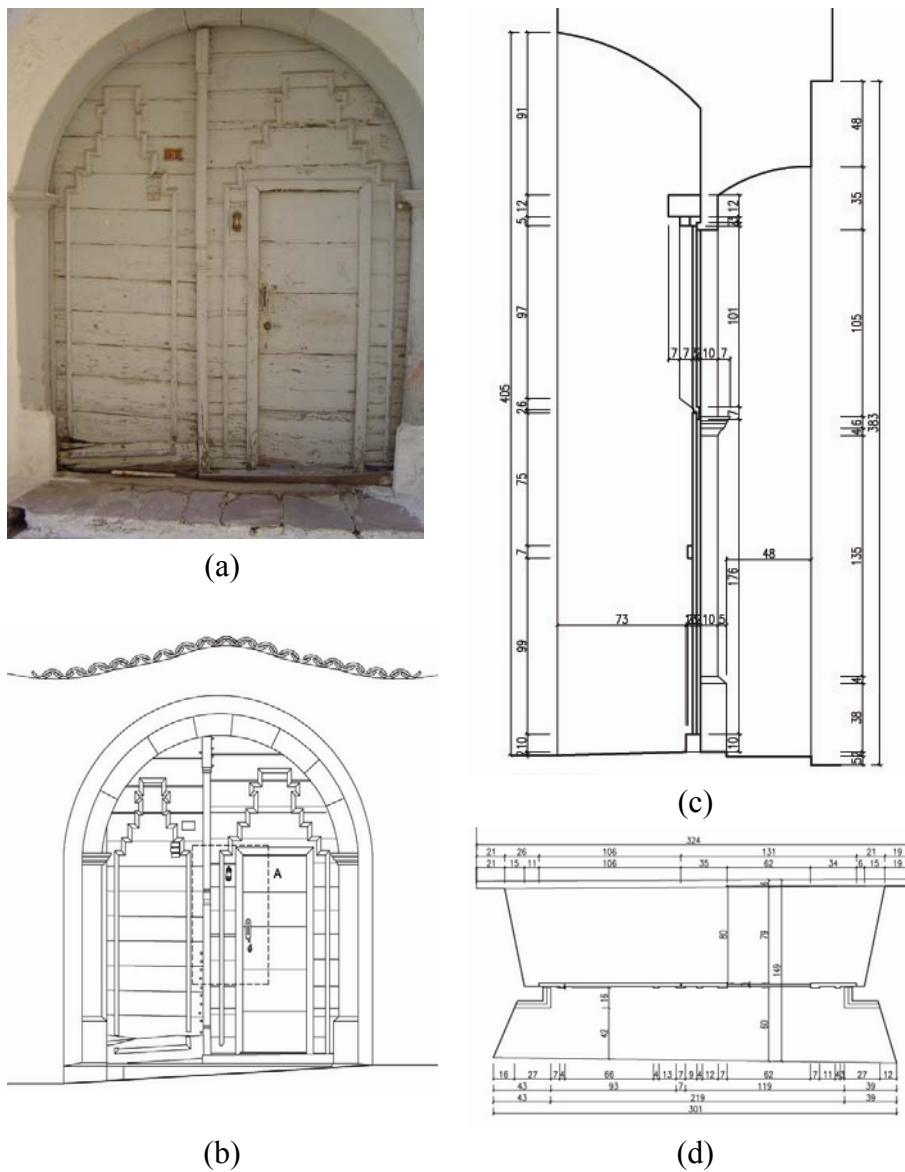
Example of a kuzulu kapı. a. front view, b. elevation, c. section and d. plan (Arasta St. No: 9) (Source: İYTE 2005)
